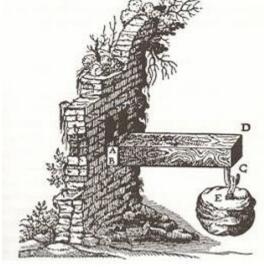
Galileos cantilever beam embedded in a masonry wall.
